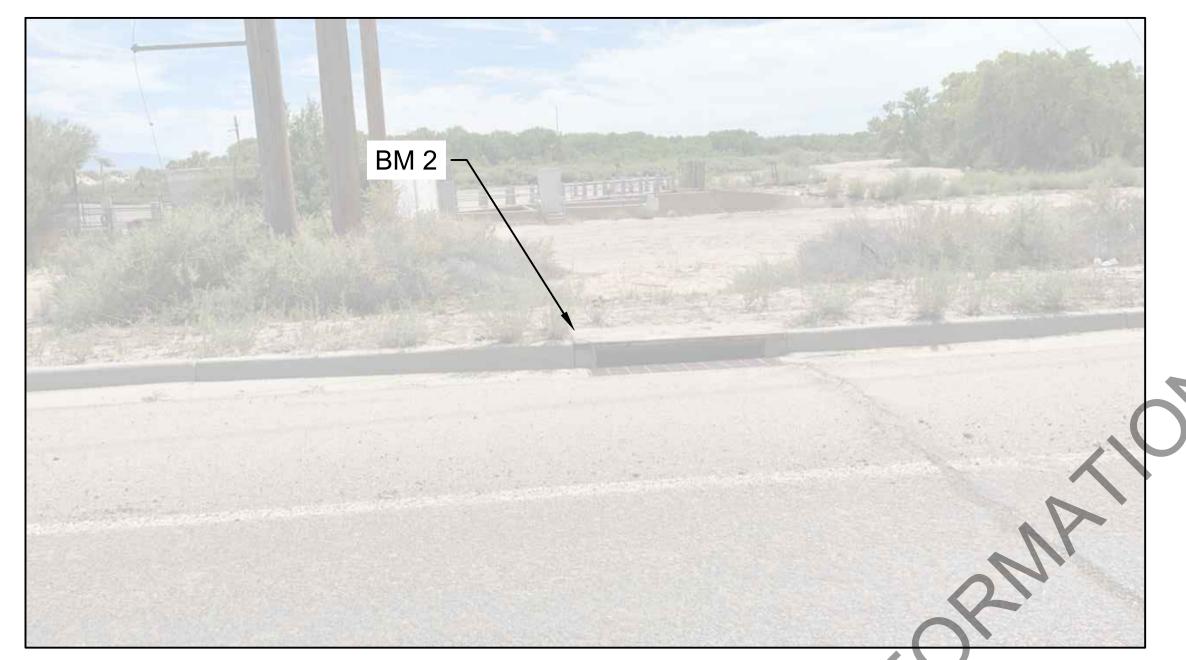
BENCHMARK 2 LOCATION PHOTO
